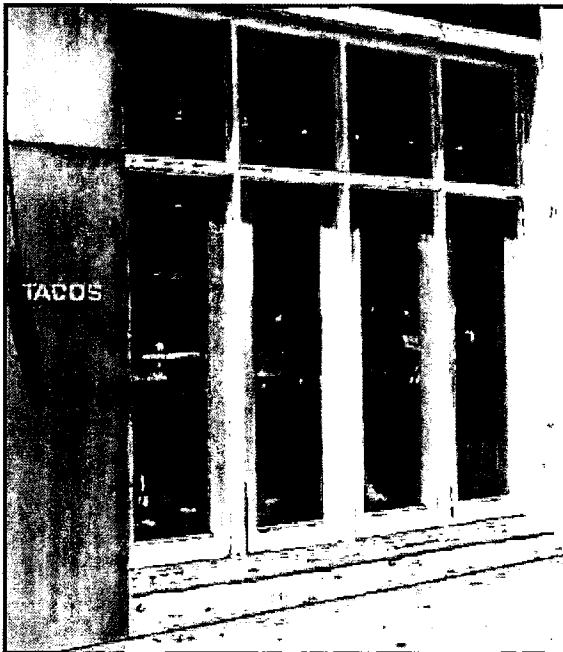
Example of proposed storefront showing aluminum storefront with wood rails and stiles.
